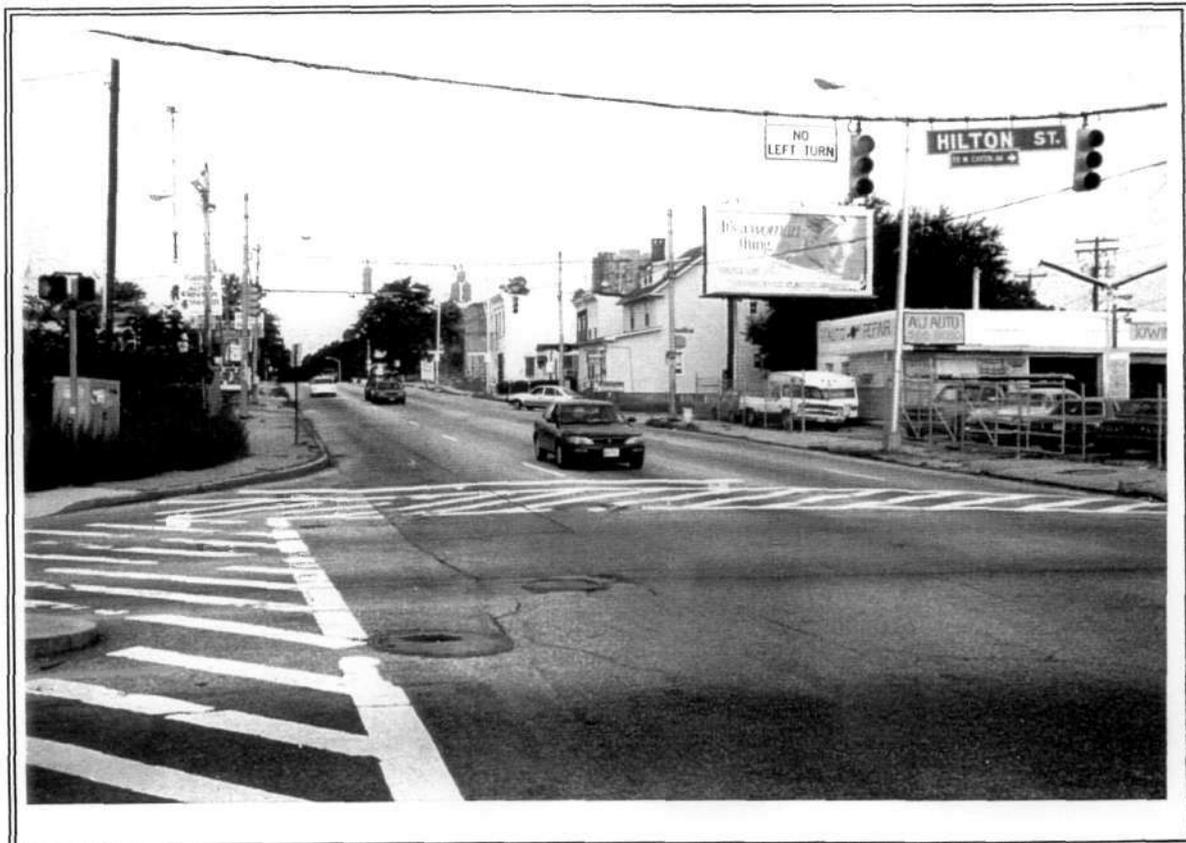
View from the southwest corner of the bridge, looking west (#5)
